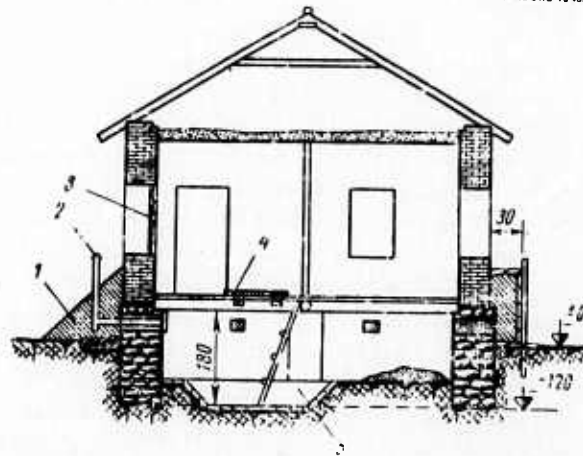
Basement of a stone house adapted for shelter: (1) earth embankment; (2) exhaust duct; (3) curtains on windows; (4) airtight hatch; (5) recessed pit. Material requirements: lumber, 0.5 m³; nails, 1 kg; earth, 3-5 m³; labor, 15-29 hr [man-hours].
